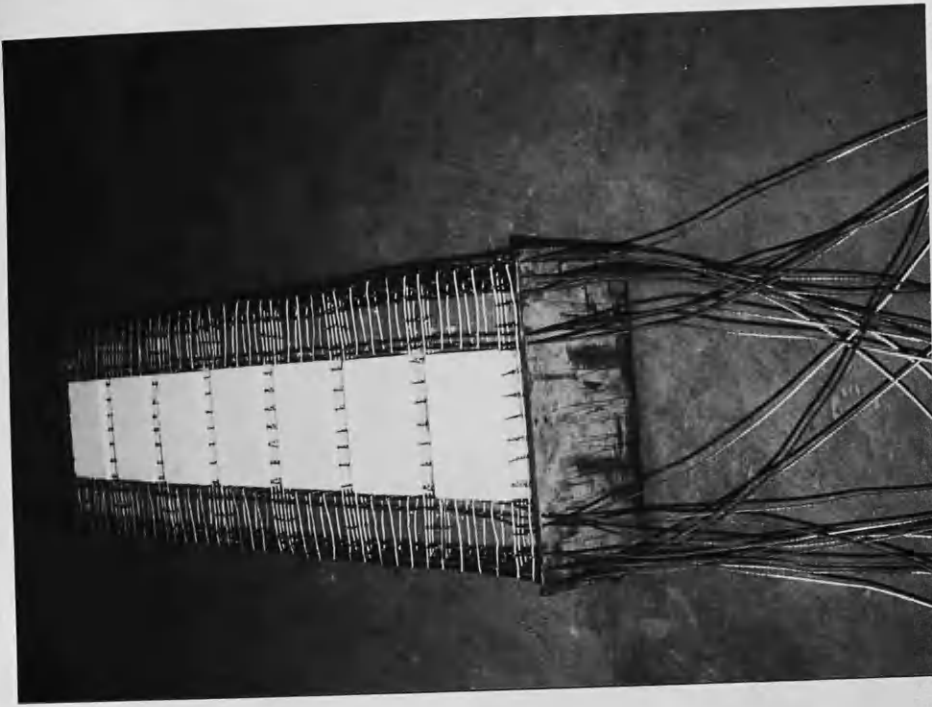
Inner shuttering and reinforcement of the back wall (doubly symmetrical model)
